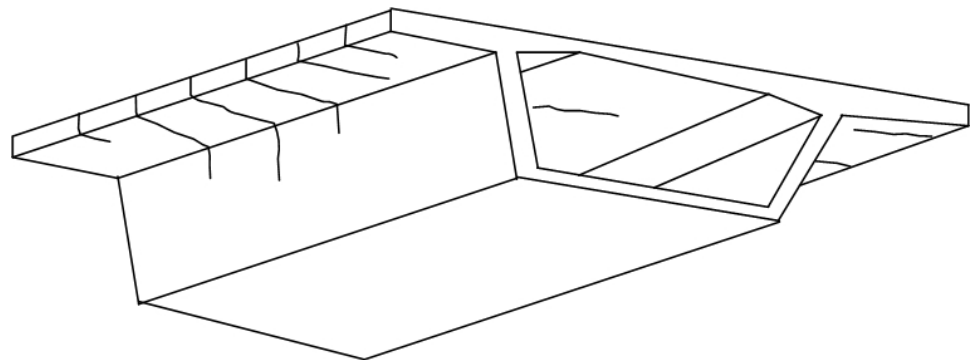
Box Girder Cracks Induced by Flexure (Negative Moment)
